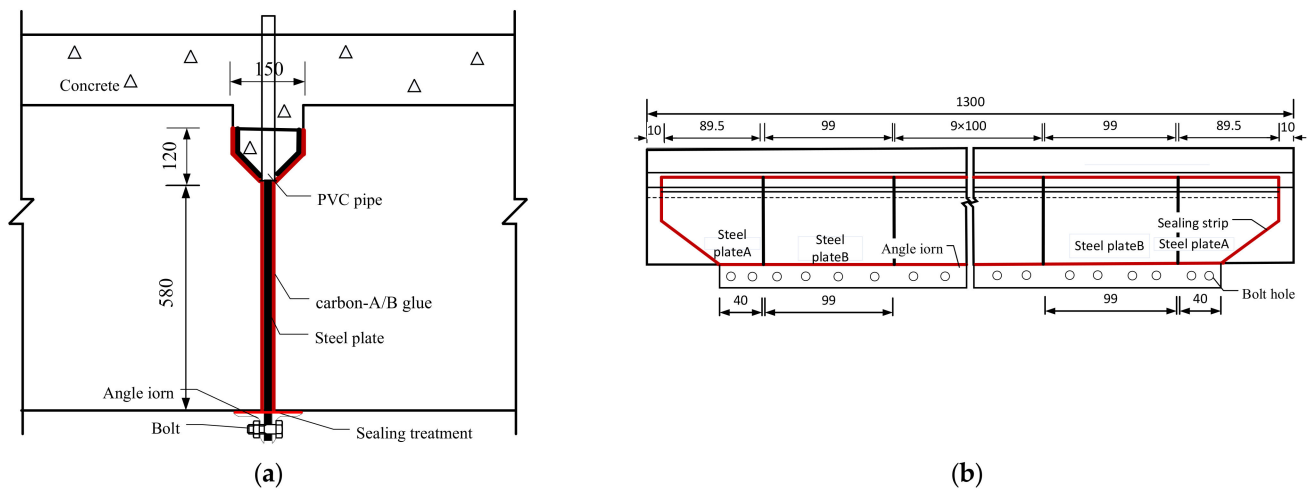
Details of inserting the steel plate. (a) Transverse section (mm). (b) Longitudinal section (cm).
